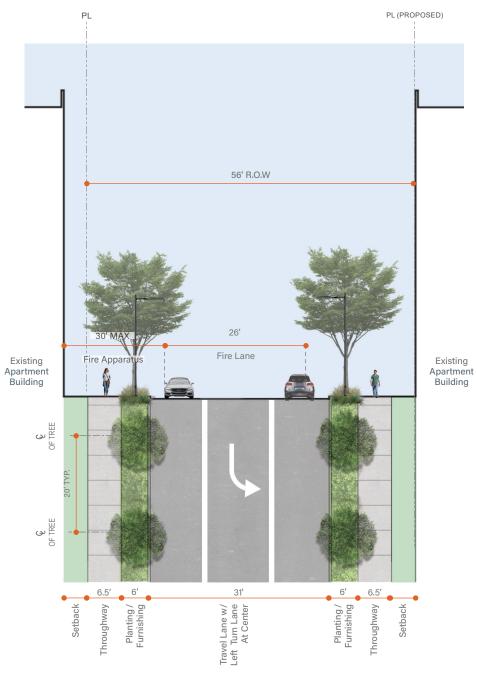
Lee Avenue, Section 4 \*see "Figure 5.13–2: Lee Avenue, Site Plan Enlargement L.1"5
